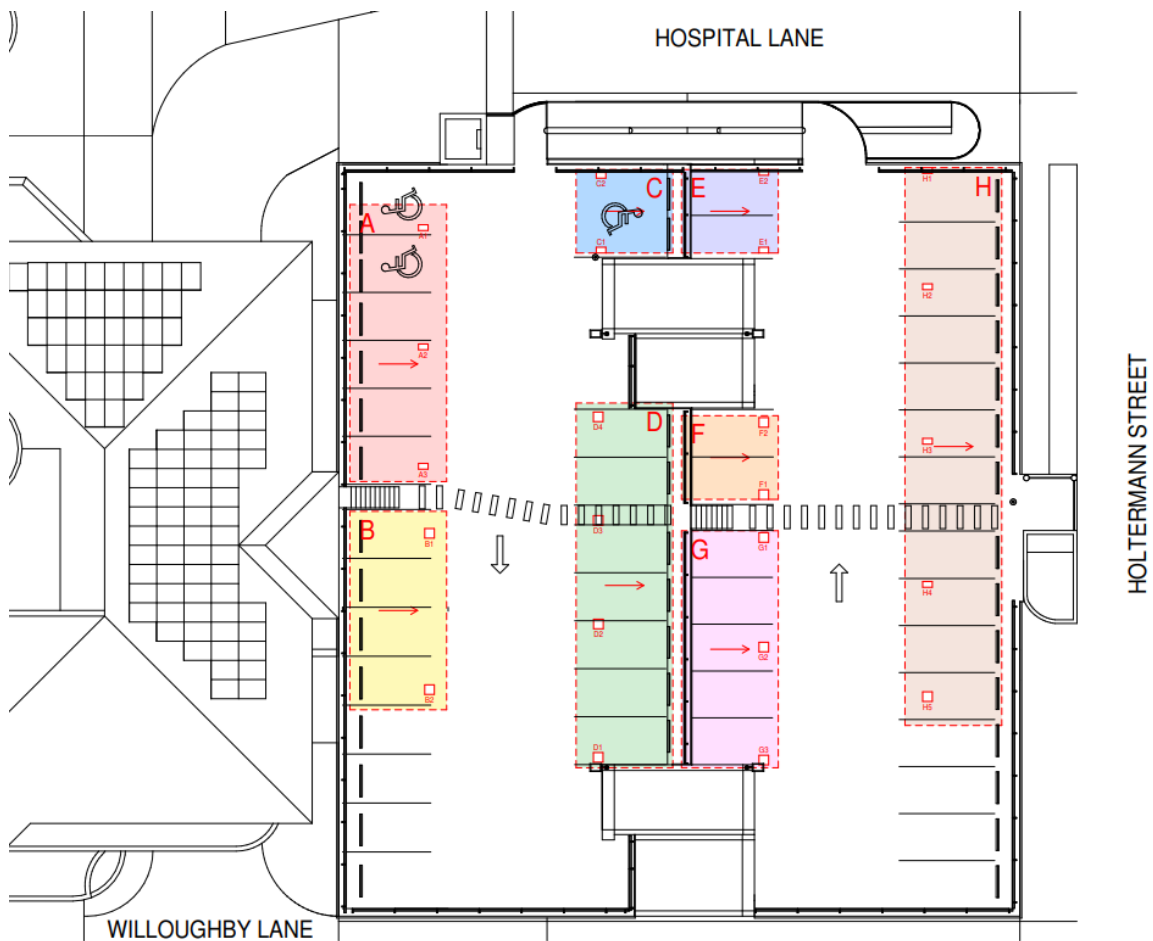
Holtermann Street carpark indicating carports to be removed (excerpt of plan 002, NBR5 Architecture)
